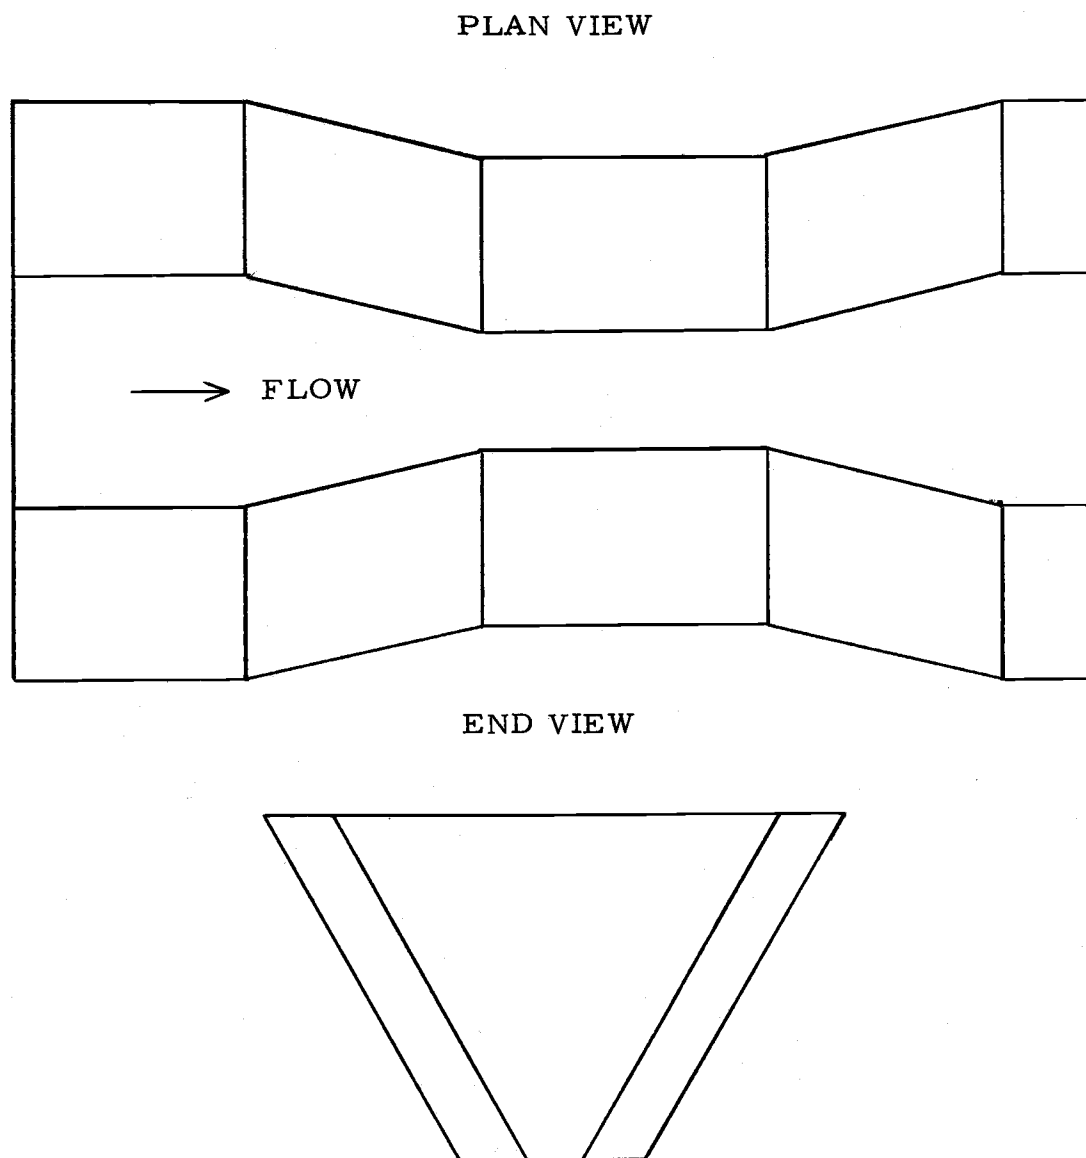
Plan and end views of venturi trapezoidal flume of the type used on Deer Creek II and III.
